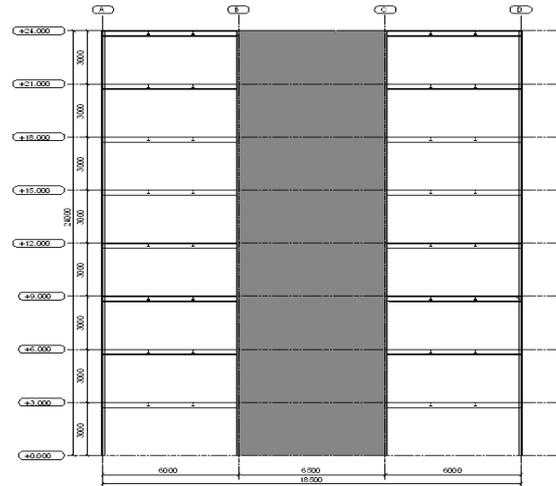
RC Shear Walls (Axis 1, 3 and 4) & (A, B, C and D)
